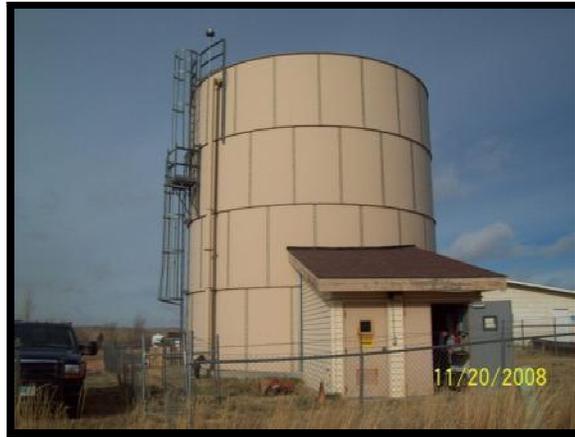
FORCE ROAD JOINT POWERS BOARD WELL #1
